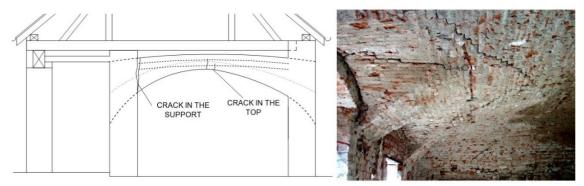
Examples of the cracking of masonry arches and vaults
